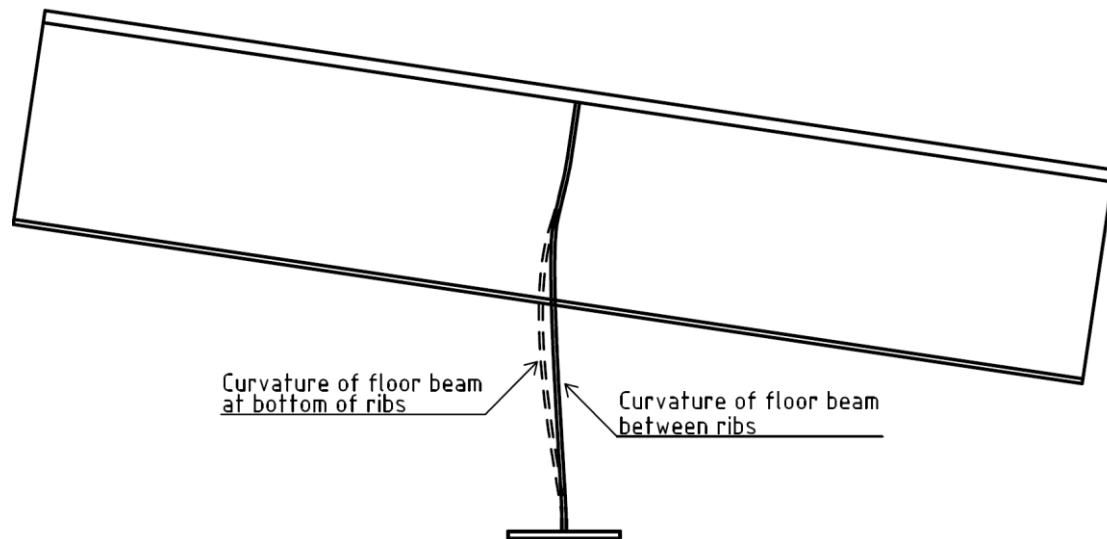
Deformation of floor beam web tooth when left rib is loaded with a point load directly above the right wall (Kolstein, 2007)
